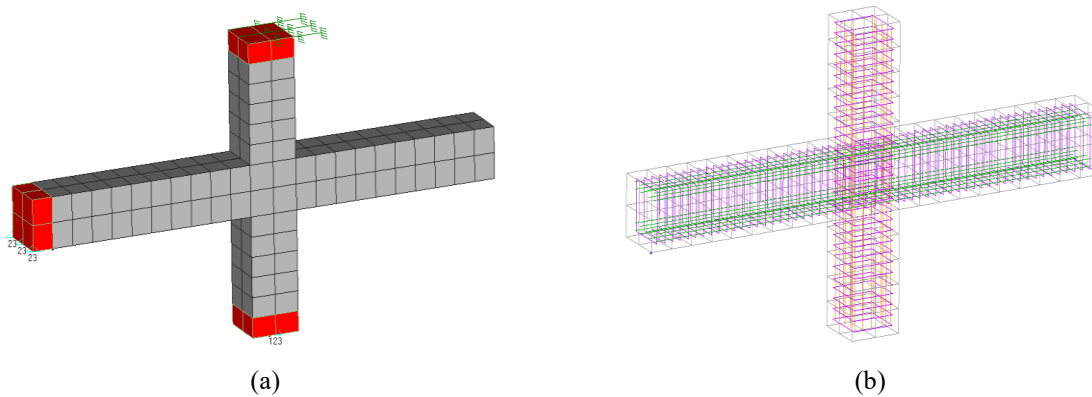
RC beam-column frame joint. 3D views of the FE mesh of (a) concrete and (b) steel reinforcement elements.
